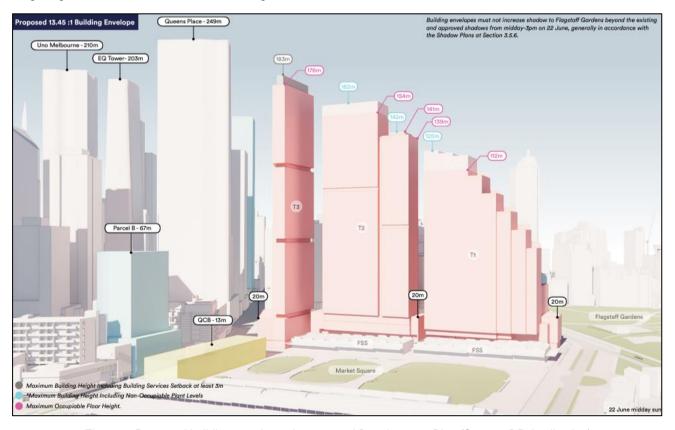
Proposed building envelopes in approved Development Plan (Source: DP Application)
